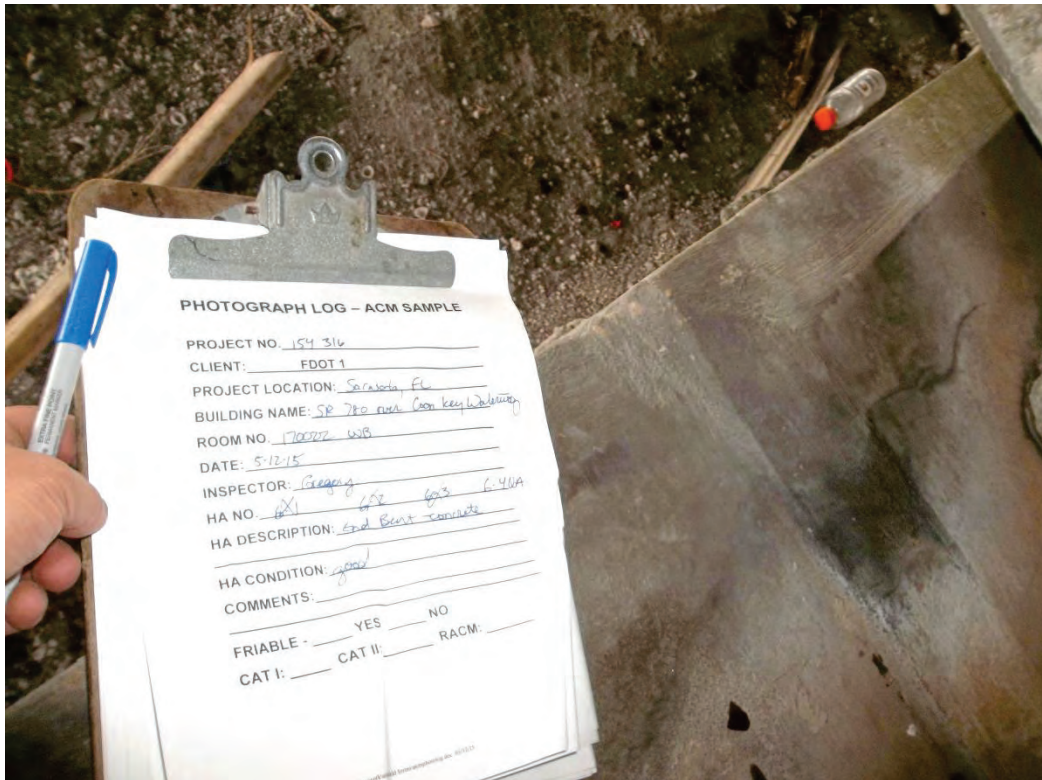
5/12/15 – SAMPLE 6.2 – HA 6
